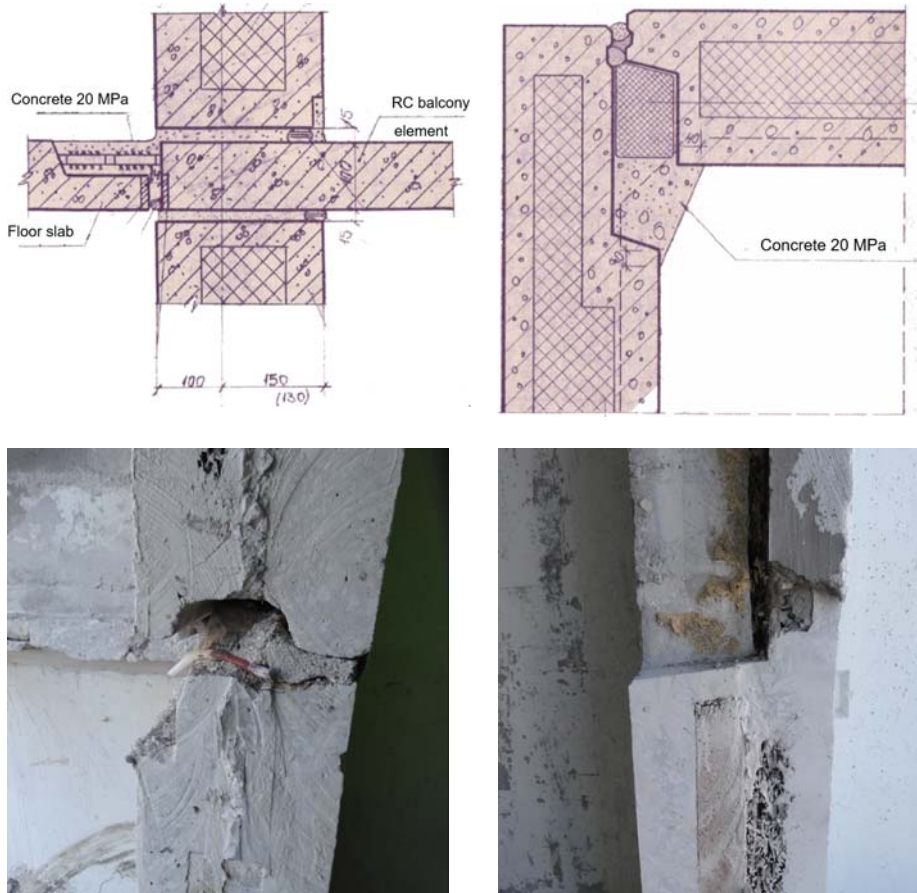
Typical thermal bridges caused by discontinuous thermal insulation: the junction of an external wall, inserted floor slab and balcony (top left) and the junction of an external corner (top right) based on original drawings. Photos of an external wall and balcony junction (bottom left, balcony is removed) and external wall, window junction (bottom right).
